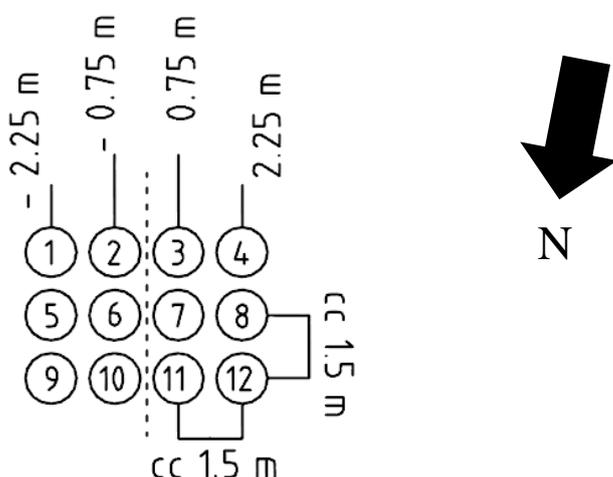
Installation order and installation pattern for LC-columns under the service road.
